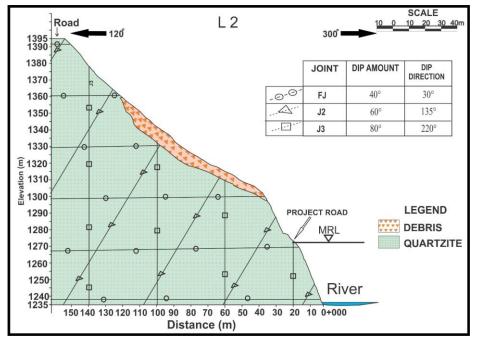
Geological cross-section of L2. Along intake of diversion tunnel, 110m
